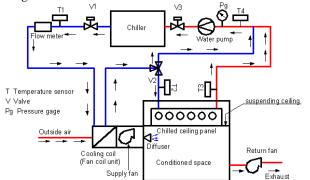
Schematic diagram of tested chilled ceiling panel with dedicated outdoor air system
